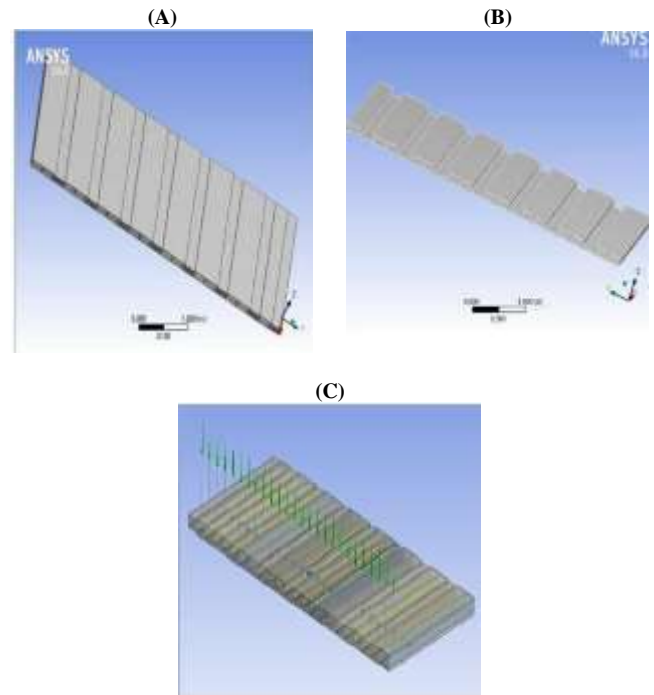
Model of Gypsum Panel Strengthened with Glass Fibres A) Hollow Panel B) PCC Filled Panel C) RCC Filled Panel.
